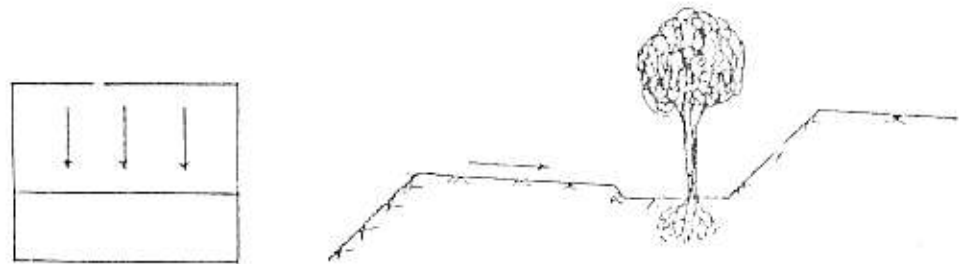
Plan and Cross Section Through Contour Trenches. Arrows Indicate the Direction of Surface Flow.
